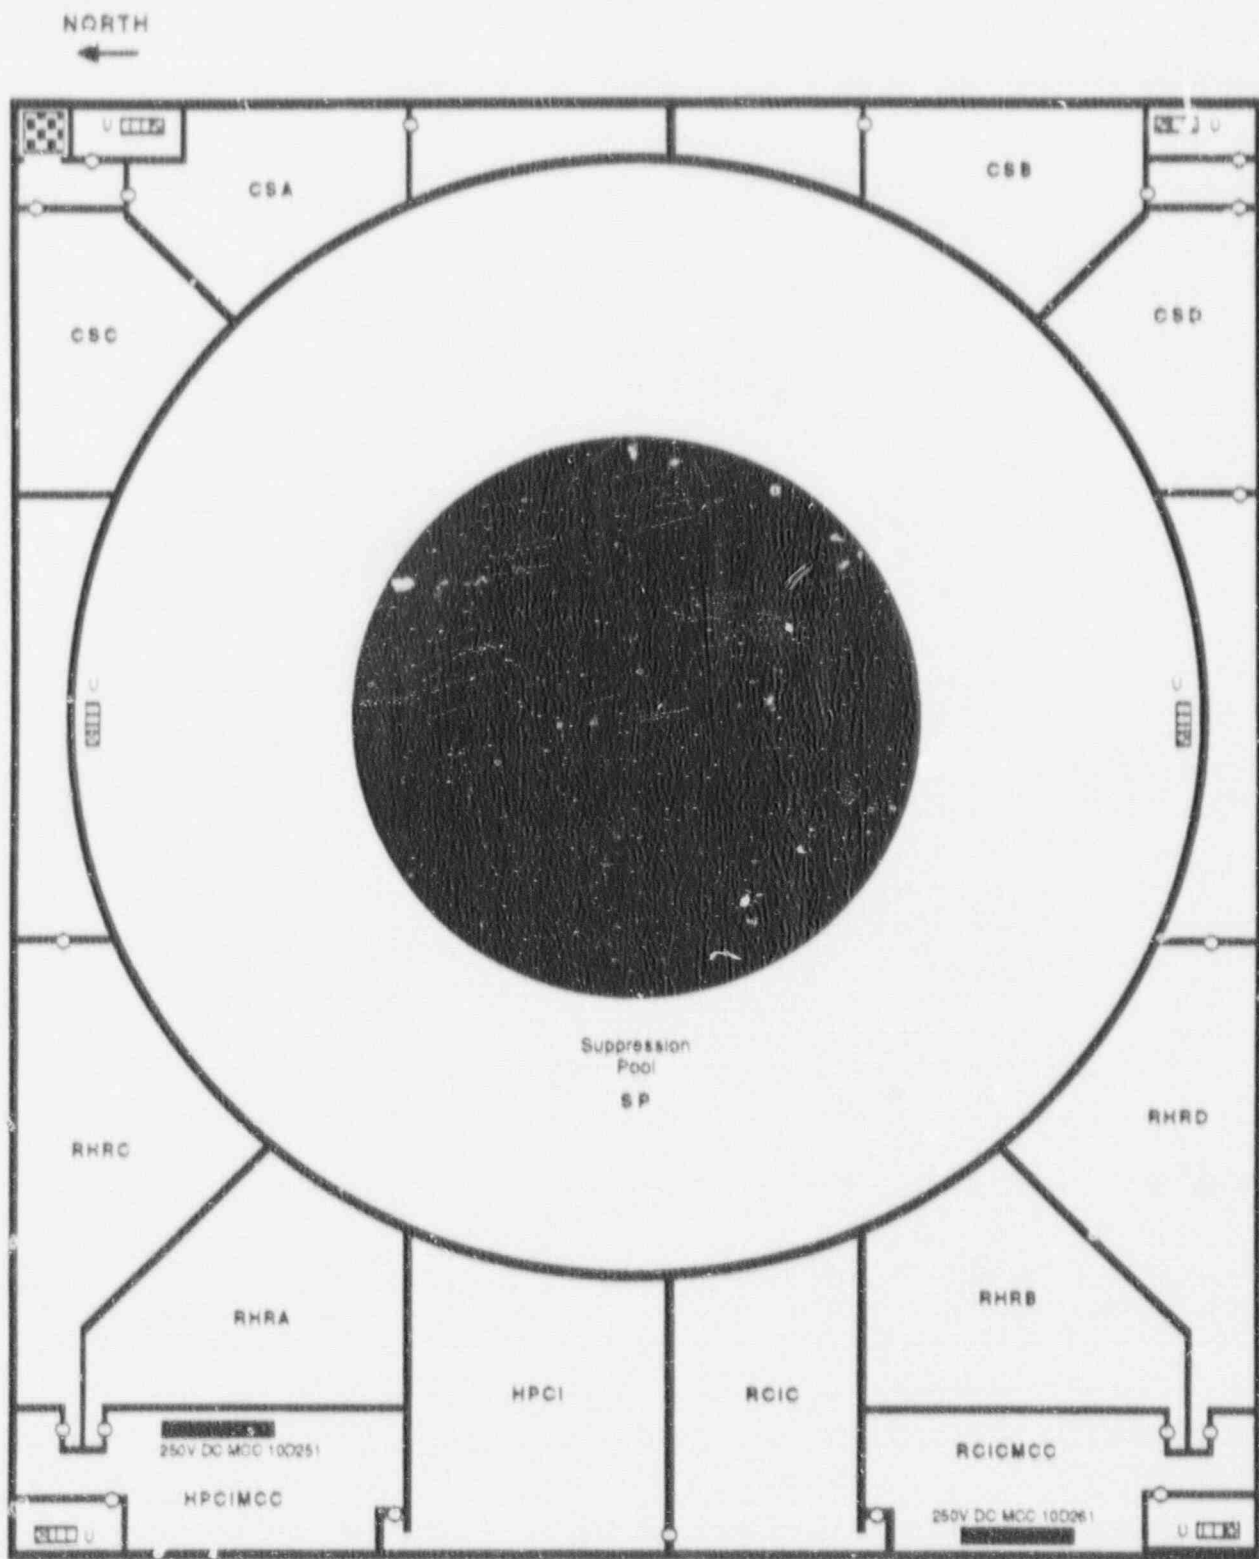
Hope Creek Reactor Building Elevation 54'-0"
